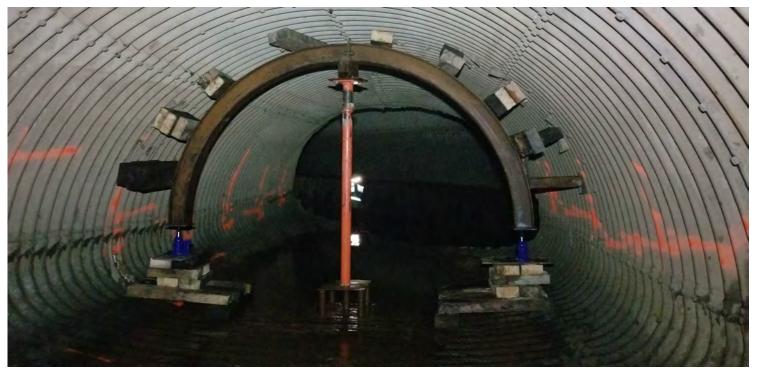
Temporary Internal Bracing to Facilitate Placement of Concrete Flowable Fill
